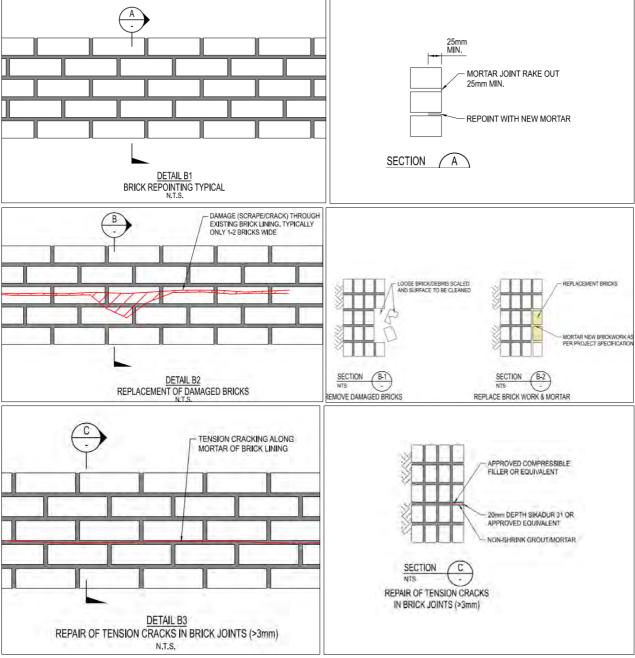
DRAWINGS SHOWING EXISTING TUNNEL LINING REPAIR WORKS. (SOURCE: AURECON/VLINE)
